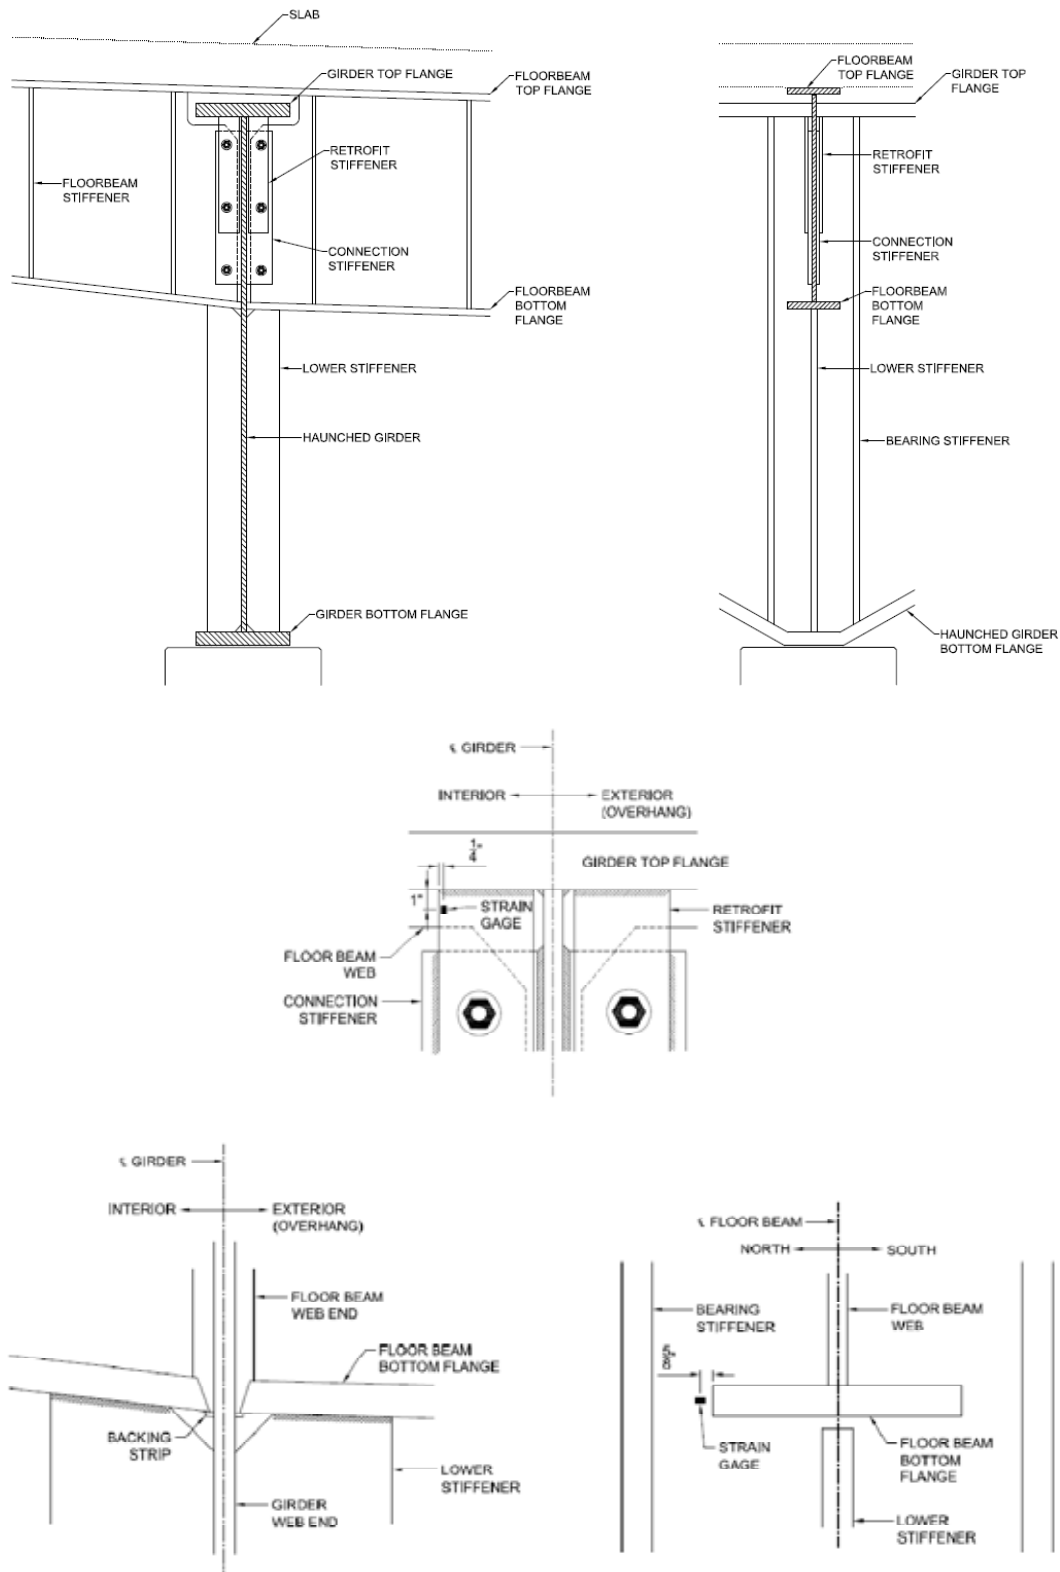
Section F17S Floor Beam 16 - Girder 2 Connection Detail and Strain Gage Locations
